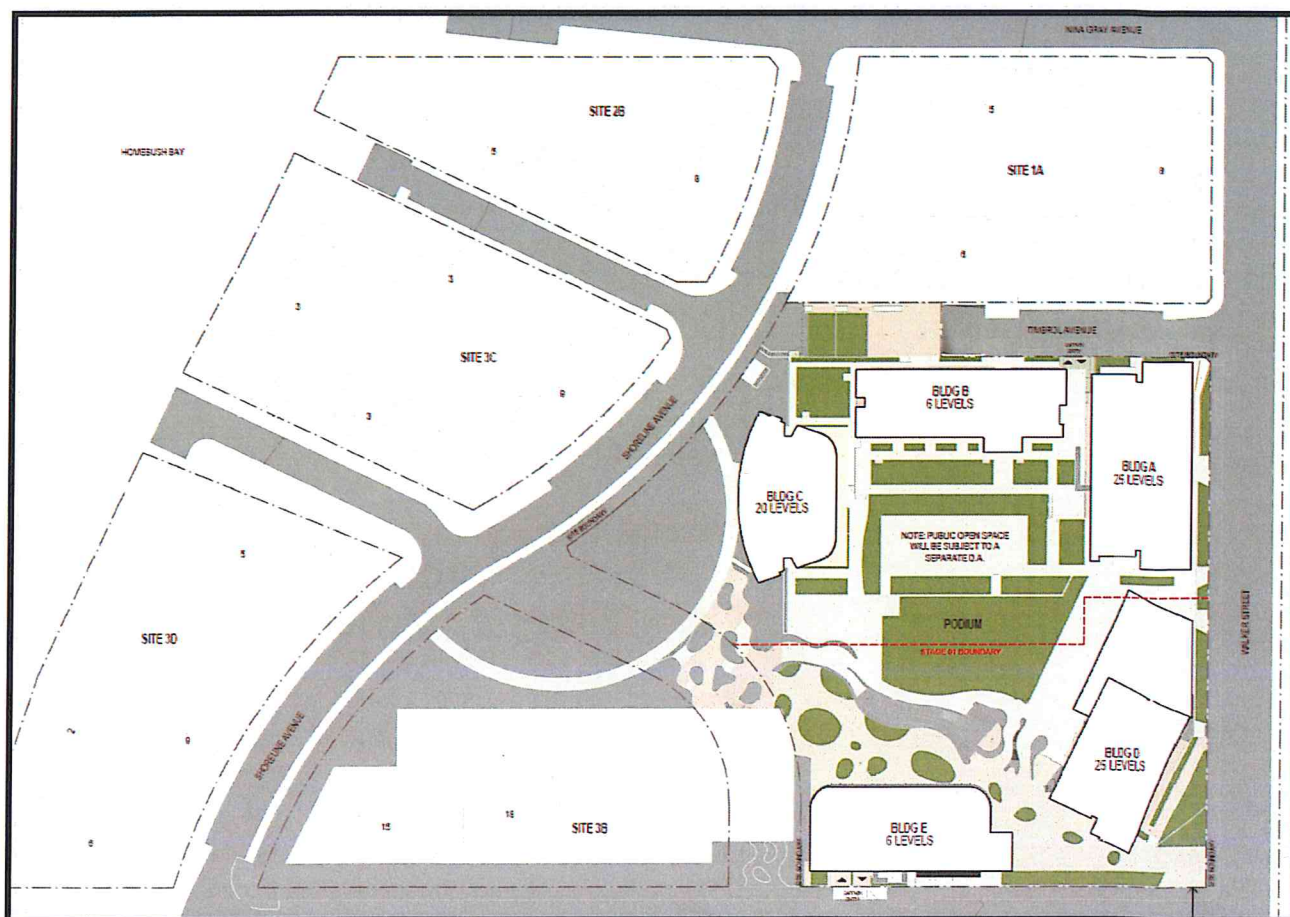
Location and approved layout of the Walker Street, Rhodes development
